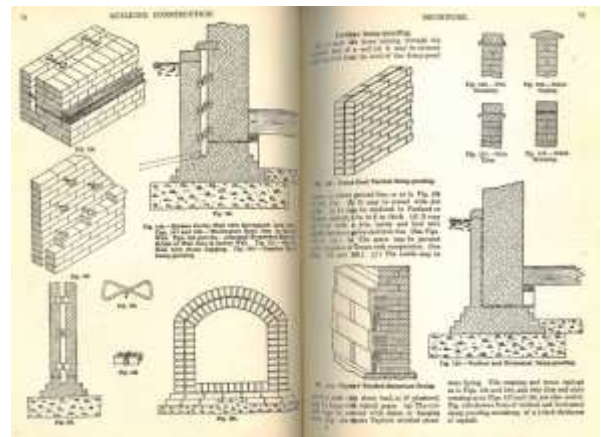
Traditional brick cavity wall construction methods (After Adams [1], 72f).
